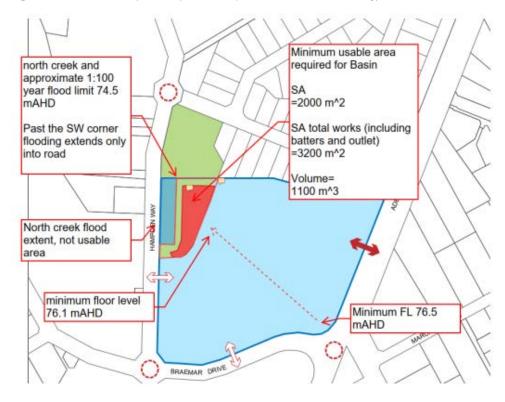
Detention space requirement (Source: Tonkin Consulting)
